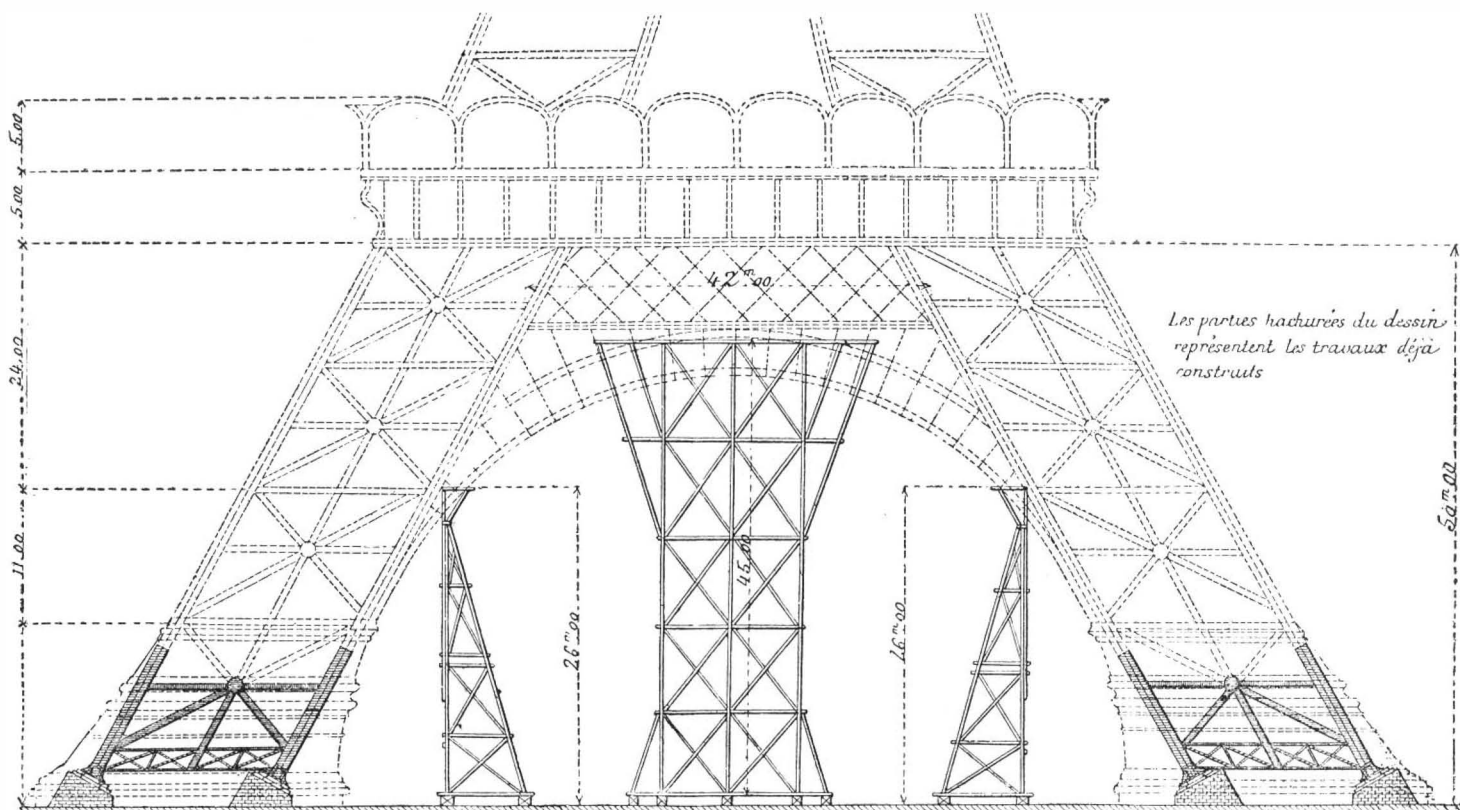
SYSTEM OF MOUNTING THE BASE OF THE TOWER.
